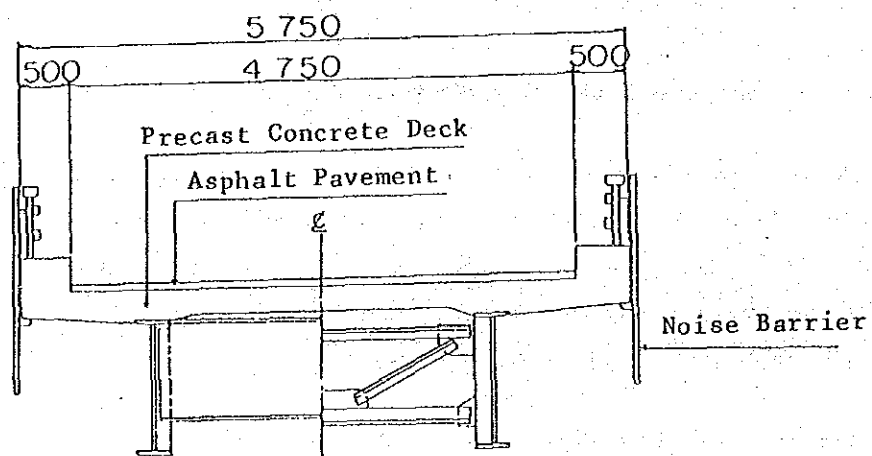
Standard Cross Section: Precast Concrete Deck
